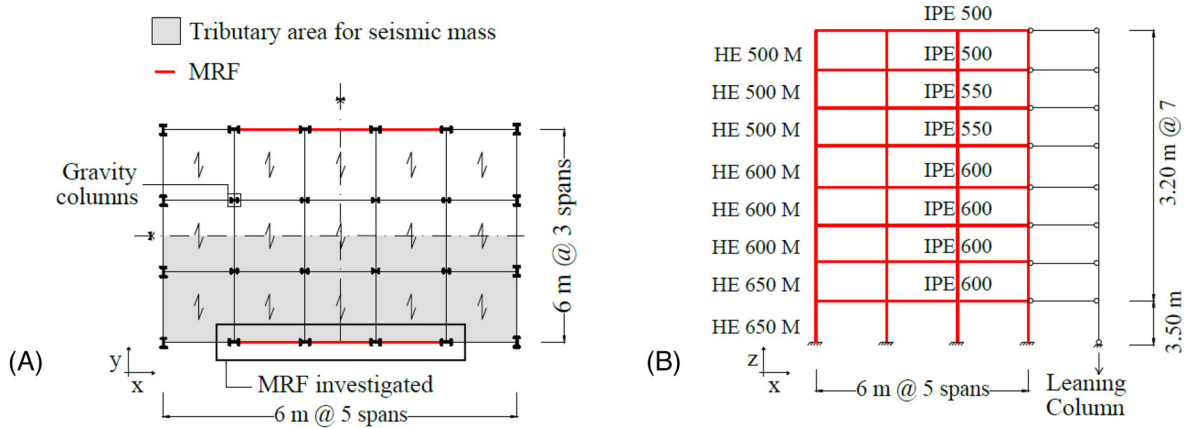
(A) Plan view, and (B) elevation view of the case-study frame
